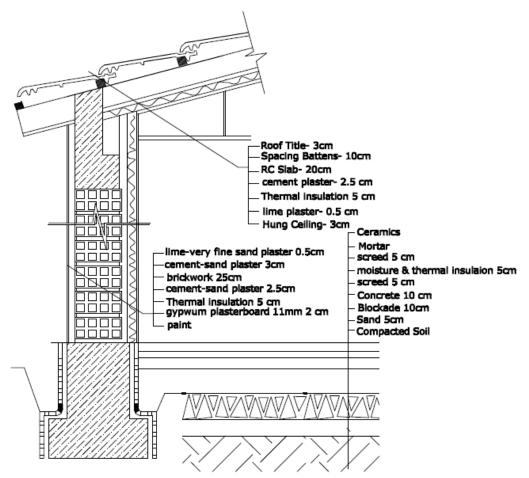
Construction Technique in Contemporary period- Brick wall - C7
